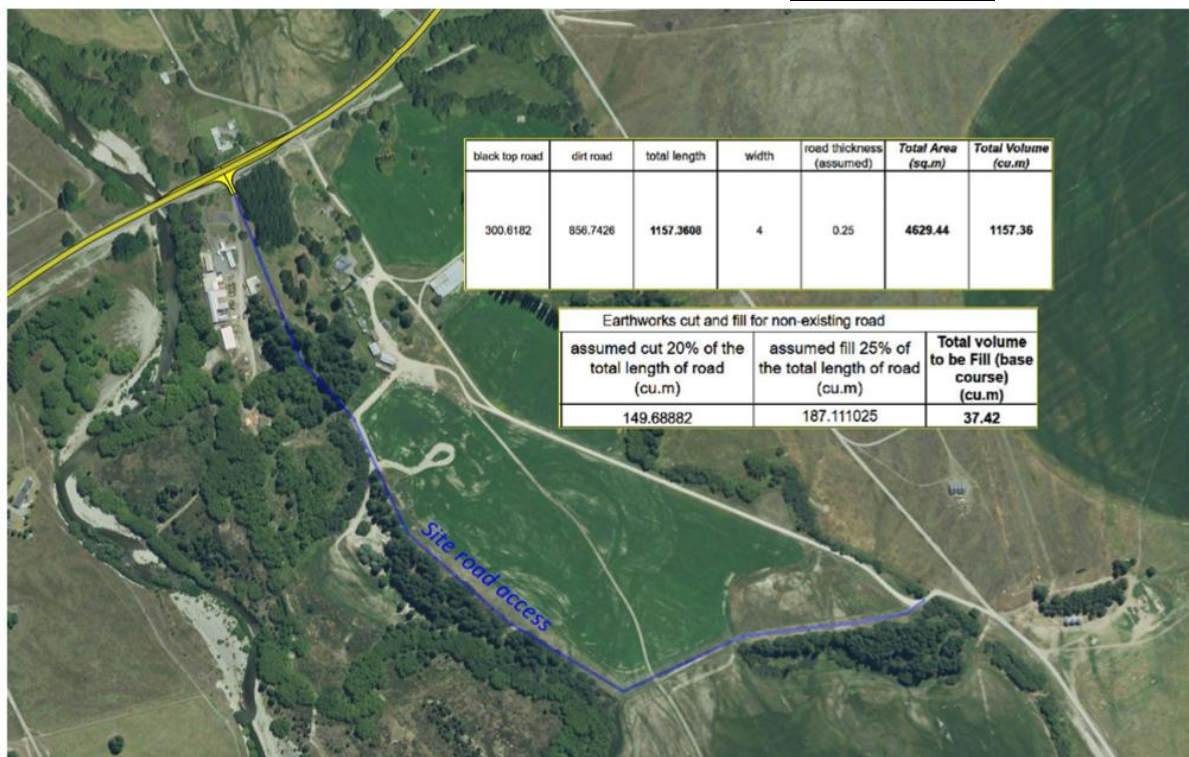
Site Access Plan Route connecting SH8(yellow) to the local site access route(blue)
